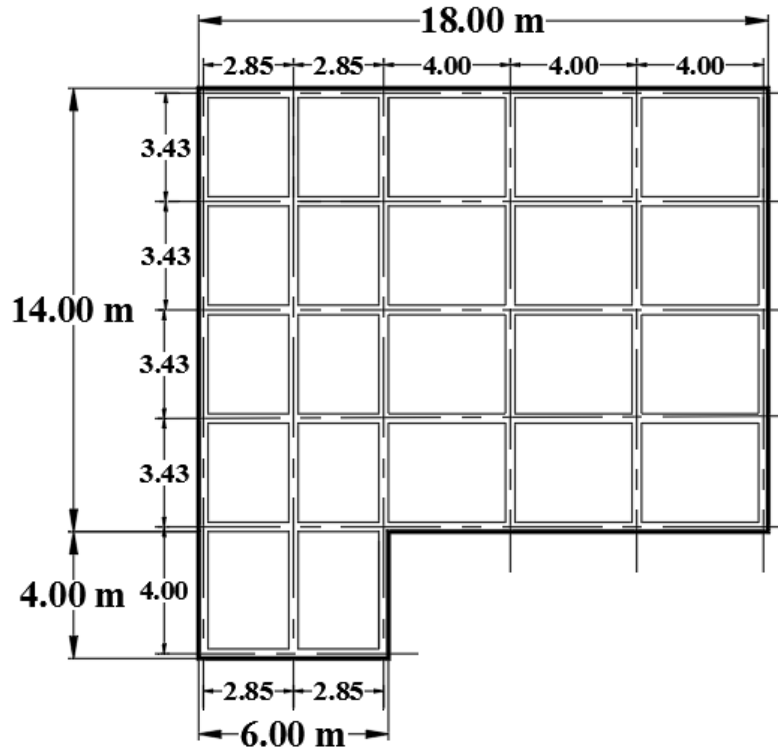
Sub-beams spacing for the slab foundation of the numerical example.
